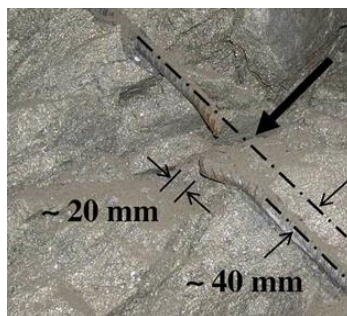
Combined load failure mechanism in situ. (Li, 2010)
